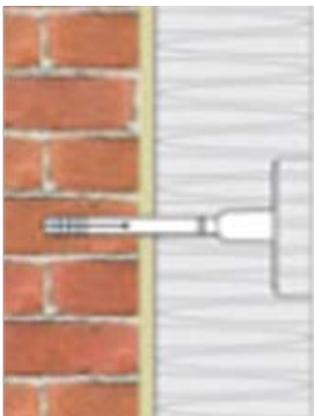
Scheme of ventilated facade composition on a brick wall with wooden bearing structure
